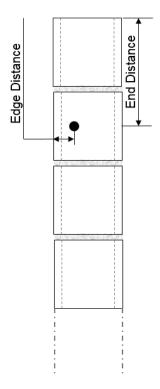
EDGE AND END DISTANCES FOR THREADED RODS INSTALLED IN THE SIDE OF GROUT-FILLED CONCRETE MASONRY
